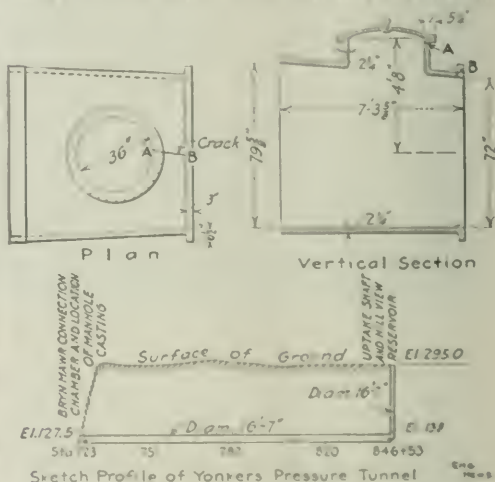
SKETCHES OF FRACTURED MANHOLE CASTING AND YONKERS PRESSURE TUNNEL PROFILE
